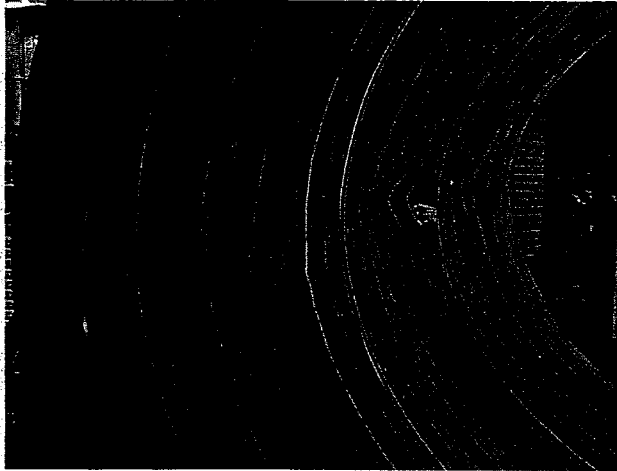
Extensive Inside Wall Local Buckling and One Wall Cracking at Vertical Deflection of 30% Diameter - ADS48
